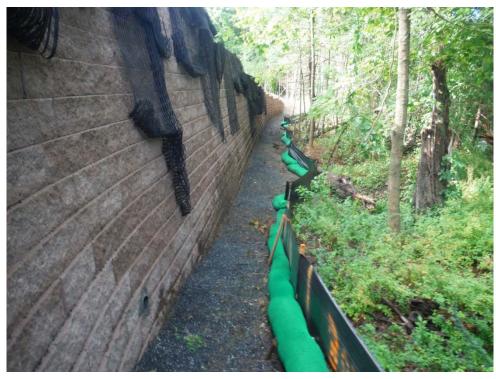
(looking south)Compost sock and silt fence west of the Pavilion building and basin 3.
